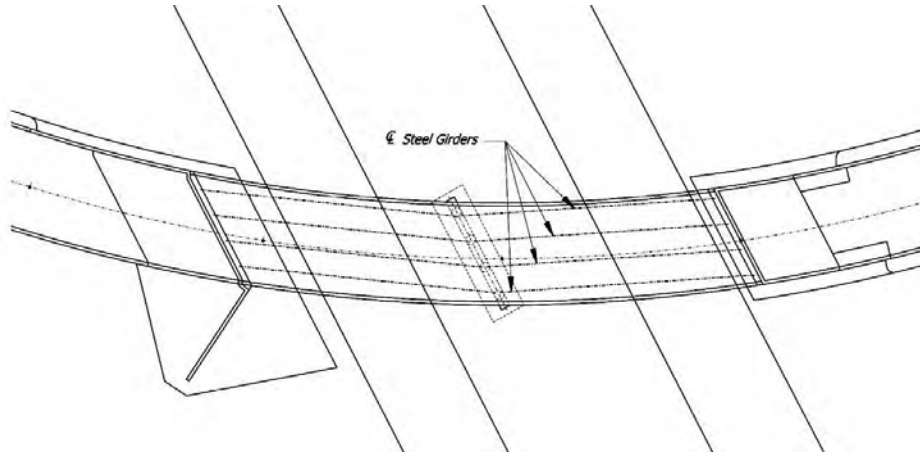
Plan view of a curved bridge with piecewise straight girders (Example 1)
